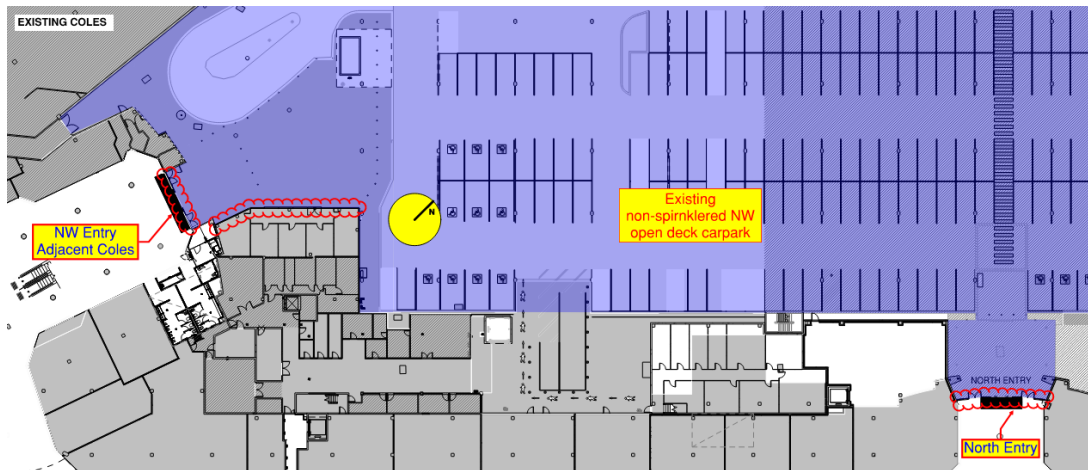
Locations where the walls between the sprinkler protected retail parts of the centre and the open-deck carpark that is not sprinkler protected have glazed sections
